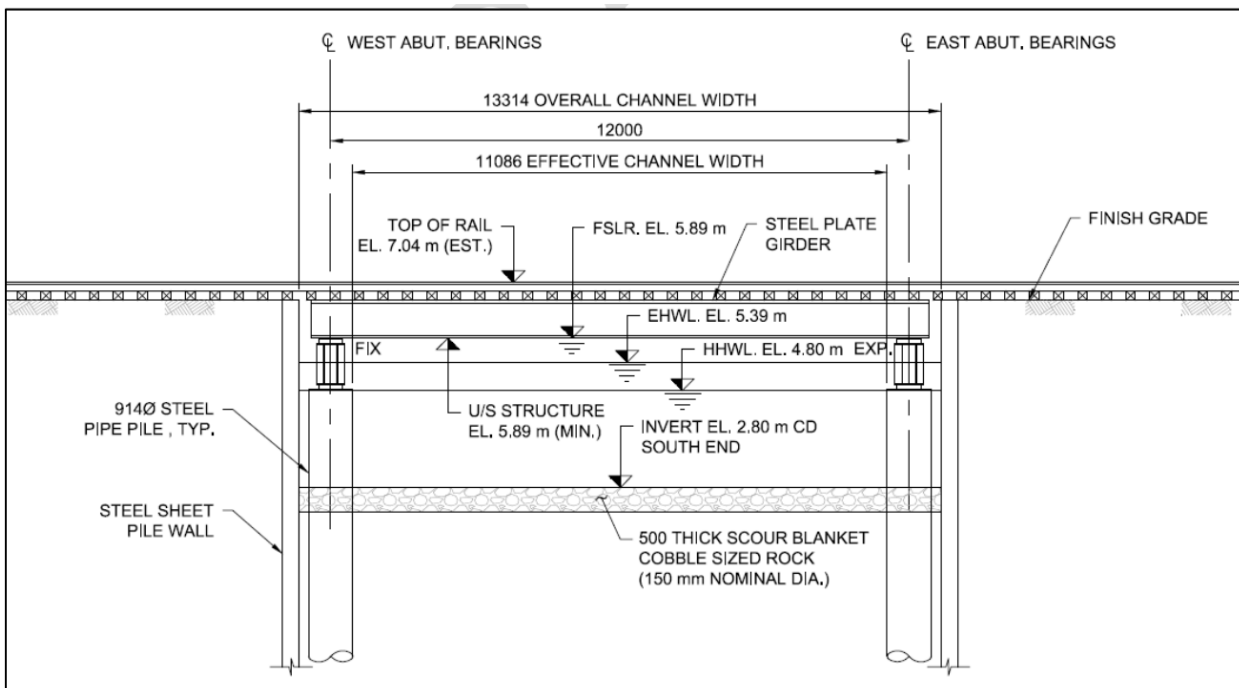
Conceptual geometry with 12 m clear span bridge structure for areas under existing causeway tracks at causeway breach location 3 (from Appendix IR2020-2.2-B). Note that elevations are preliminary.
